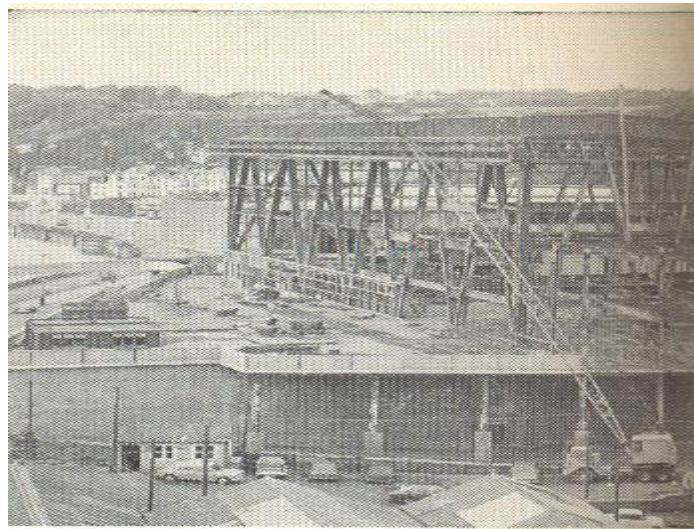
The V shaped steel frame of Summerland's upper four floors nears completion. The lowest three floors were built out of reinforced concrete (Source: *Royal Institute of British Architects Journal*, July 1974)
